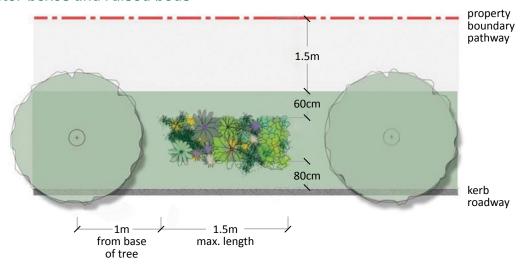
An 80cm access area must be maintained between the kerb and planter boxes. A 60cm access area must be maintained between raised beds and the footpath. A distance of 1m from the base of the tree must remain unplanted and free of planter boxes so as not to damage roots. Planter boxes must not exceed 1.5m in length.
